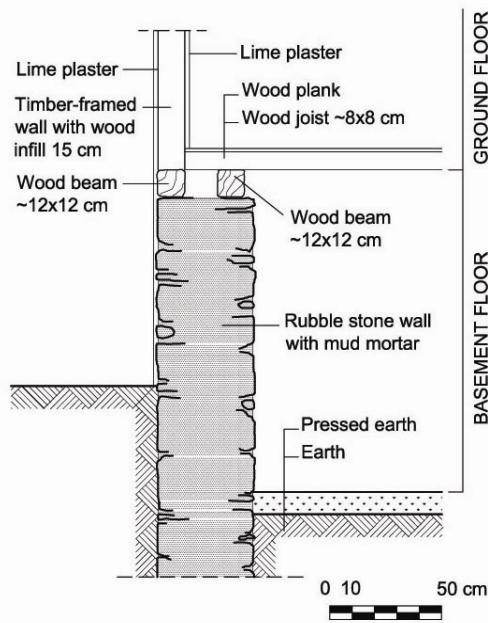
Connection detail of ground floor with *hımış* wall if there is a basement (Şeyh Cami St. No: 32)
